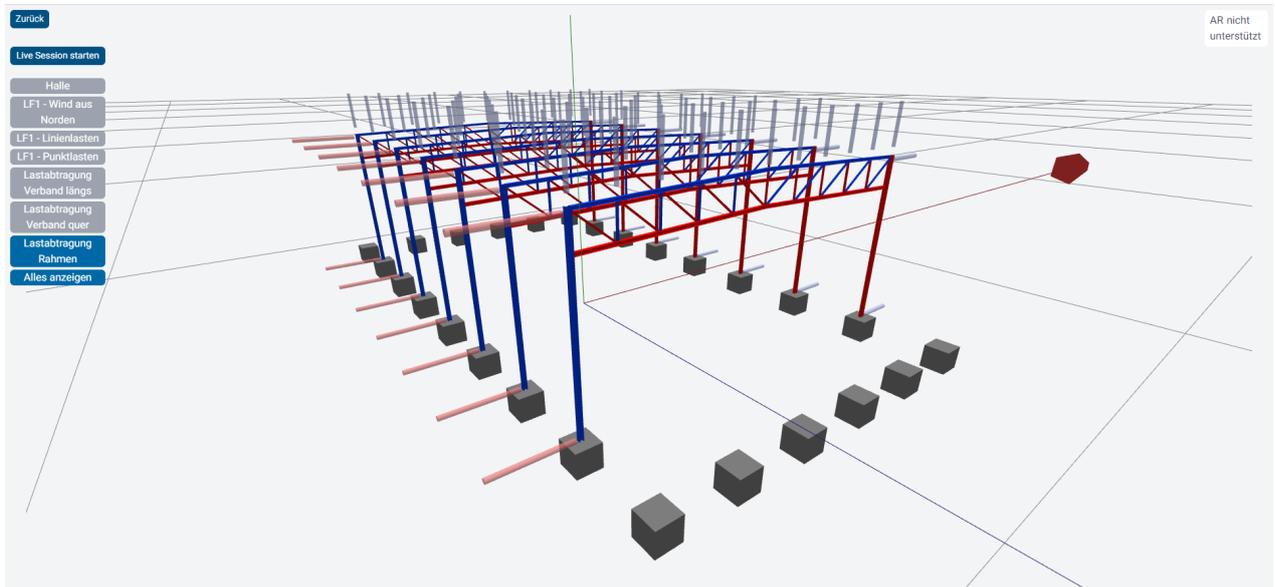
Steel hall made during the course “UE Steel Construction” with Allplan
